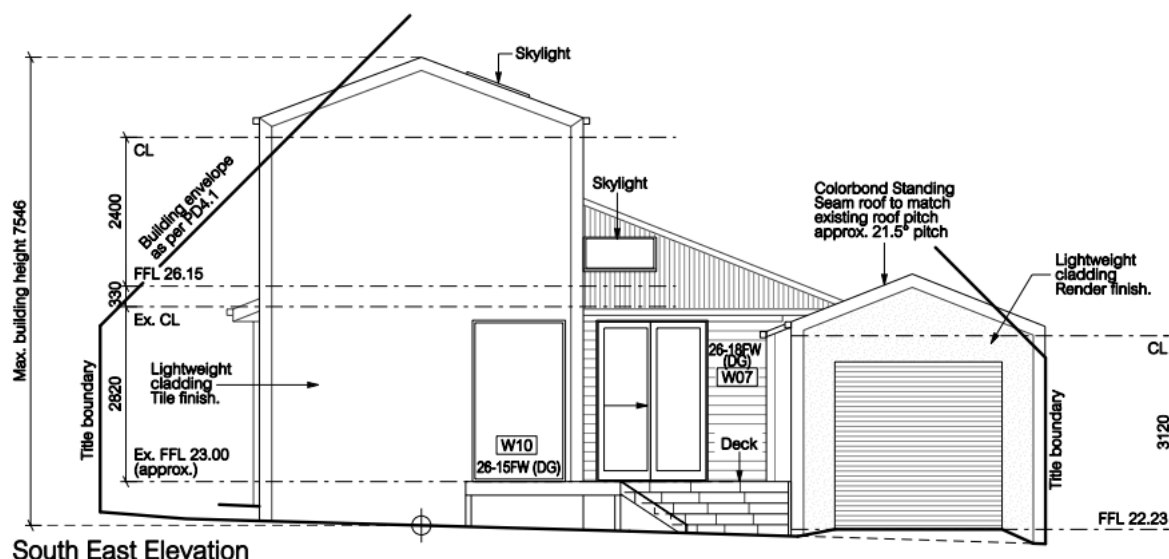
Southeast Elevation from architectural plans showing proposed FFL.
